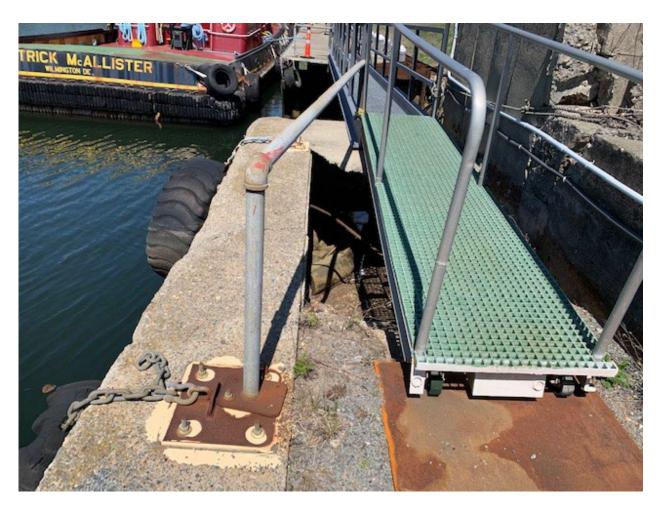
Severe settlement and soil loss adjacent to failing north concrete pen. This condition creates a dangerous condition at the support/landing at the pedestrian bridge used to access the south tug berth.
